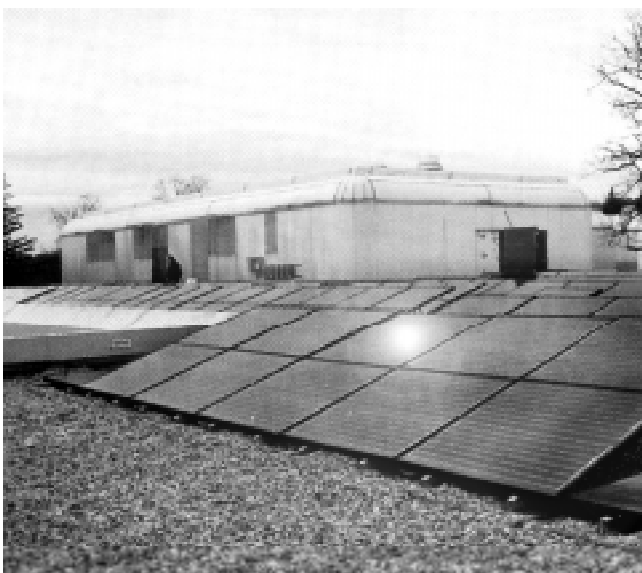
These flat-surface roof top systems are easily installed, either tied to roof beams or relying primarily on ballast to maintain position.
